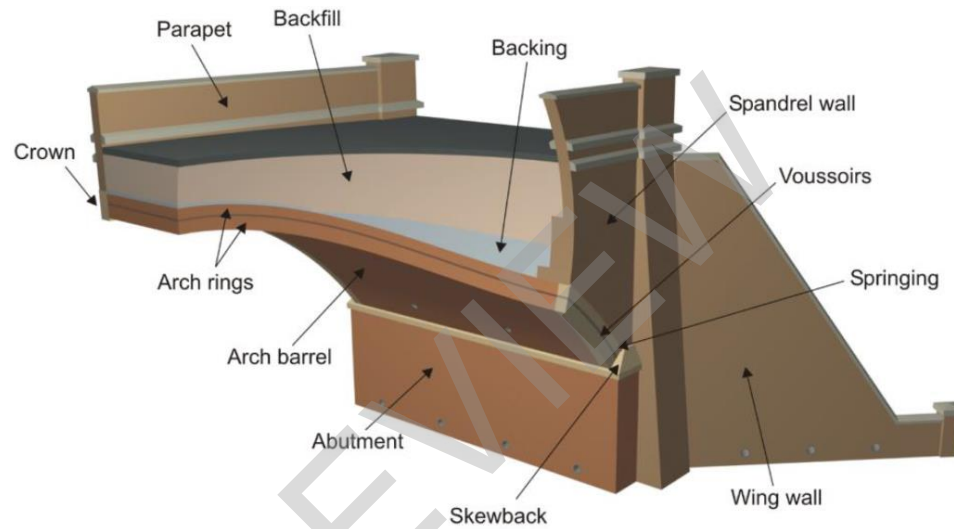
Masonry arch bridge terminology (Gilbert 2016).
